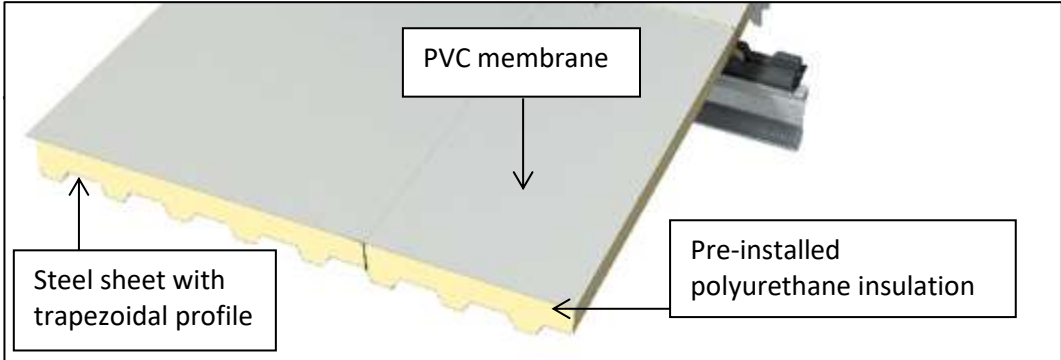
A section of a composite insulated steel deck roof system (Source: Kingspan)
